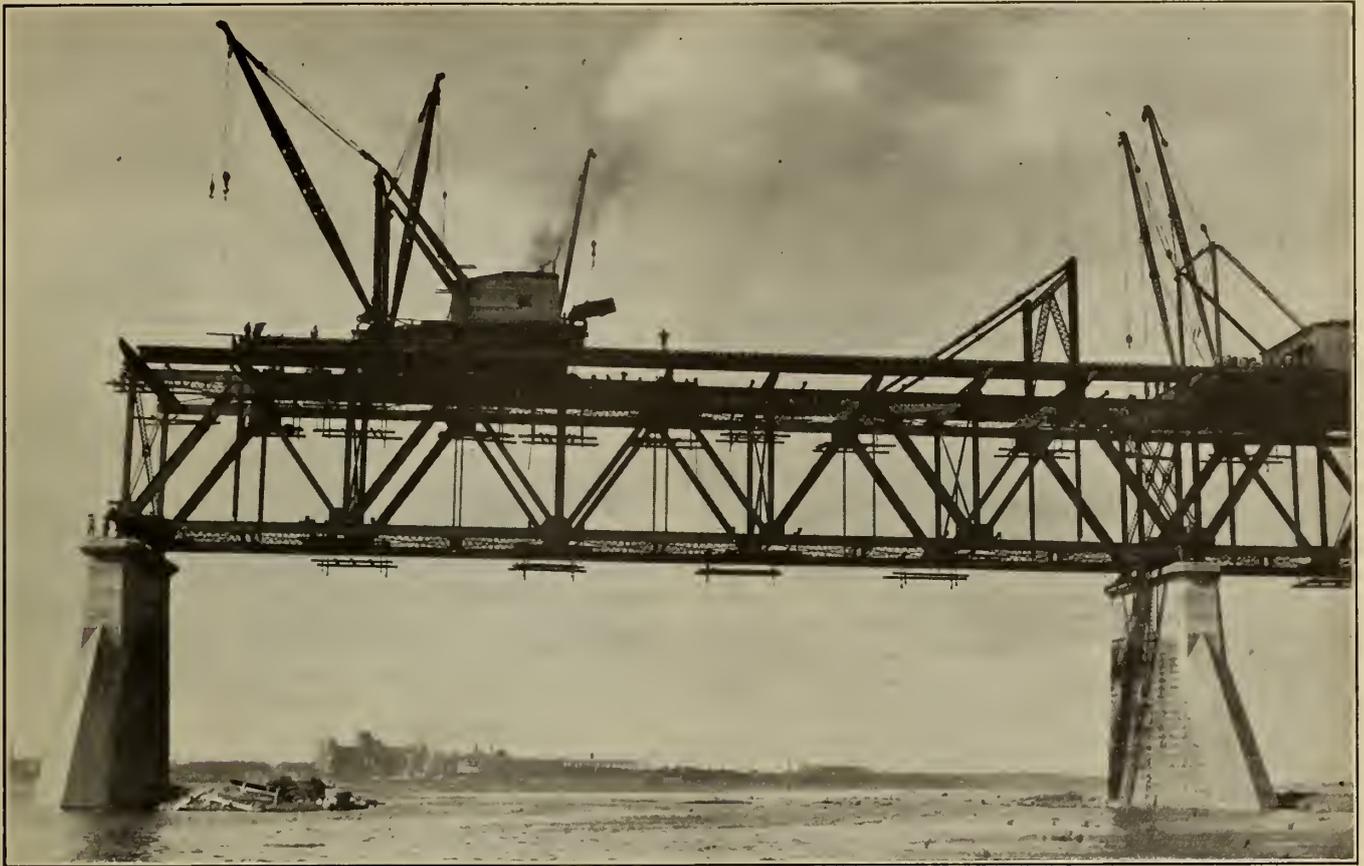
South Approach—Cantilever Erection of 245-foot Spans—Sixth Stage.
